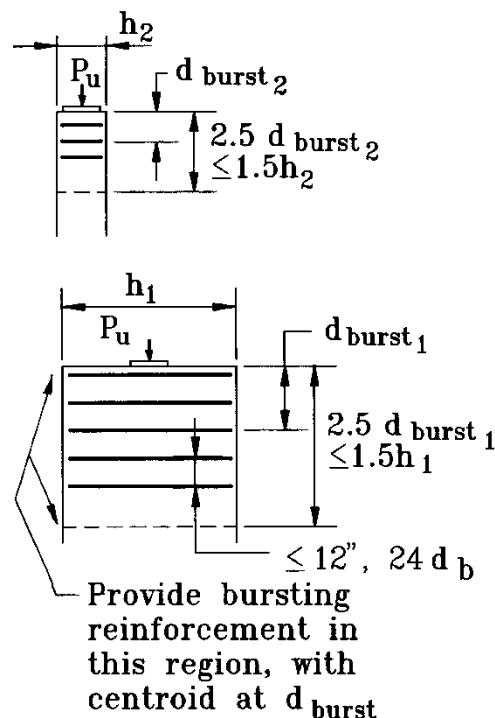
1—Arrangement for Bursting Reinforcement
